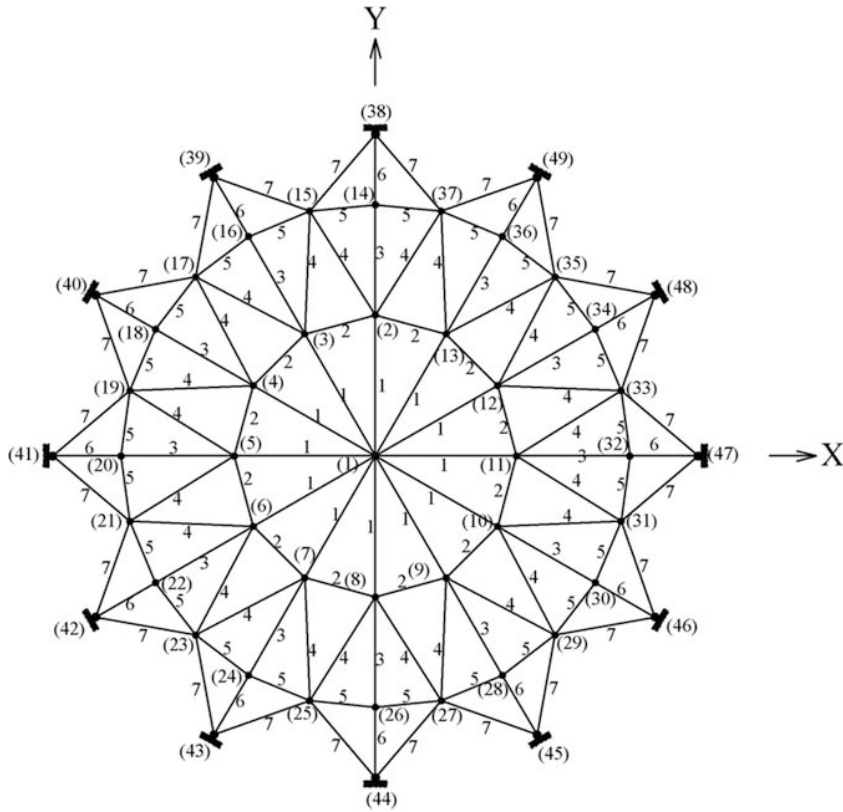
Plan view of 120 bar dome-shaped truss structure. Source: Kaveh (2017)
